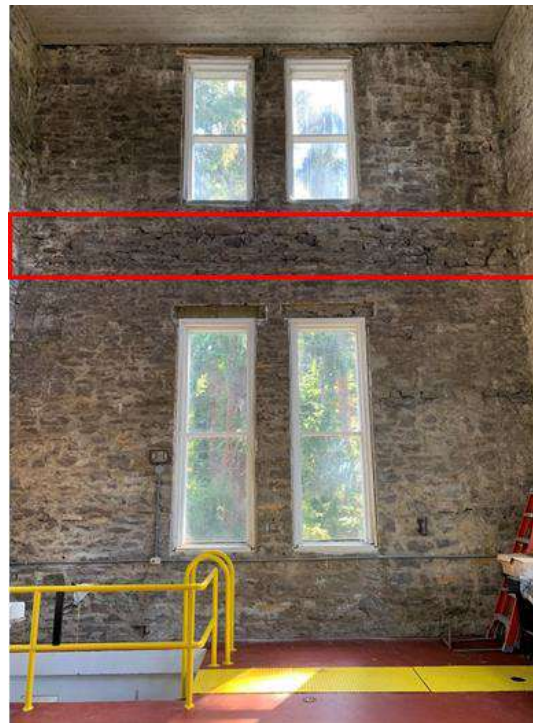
Horizontal Band on East Wall where Original 2nd Floor was Removed
